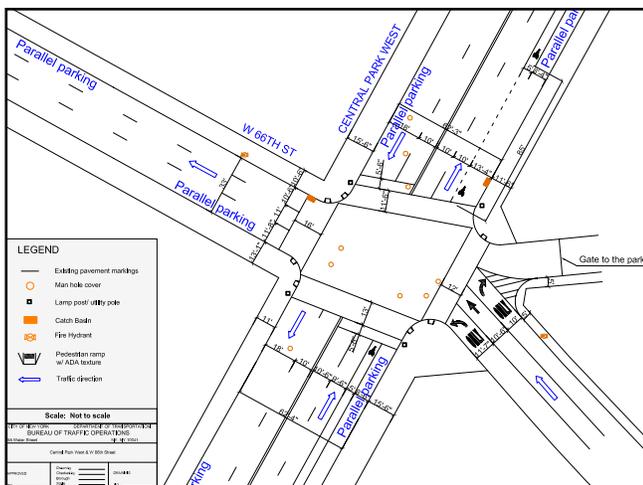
Existing Condition - Central Park West & West 66th Street
